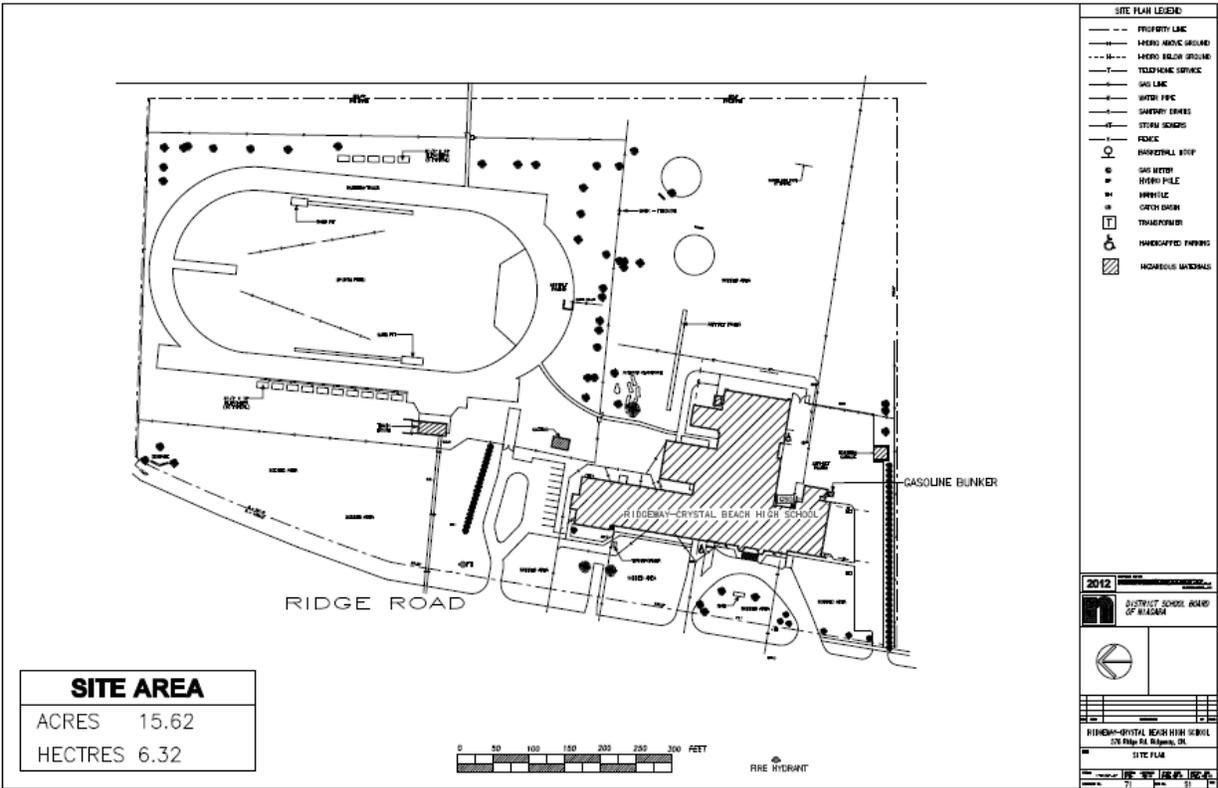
Ridgeway-Crystal Beach School General Site Plan
